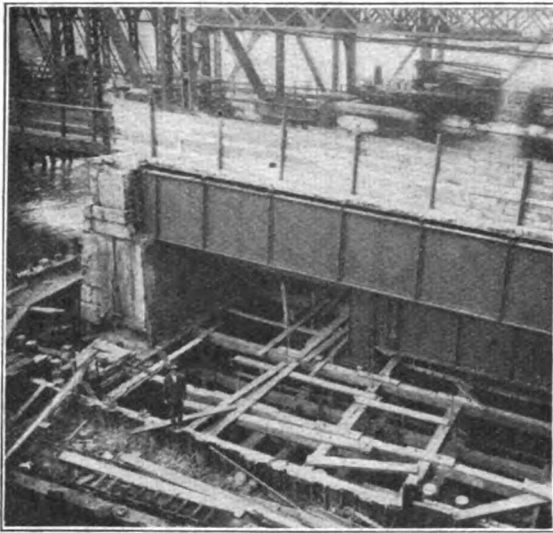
View of Excavation for Tall Pit, Showing Cofferdam and Cofferdam Bracing.
